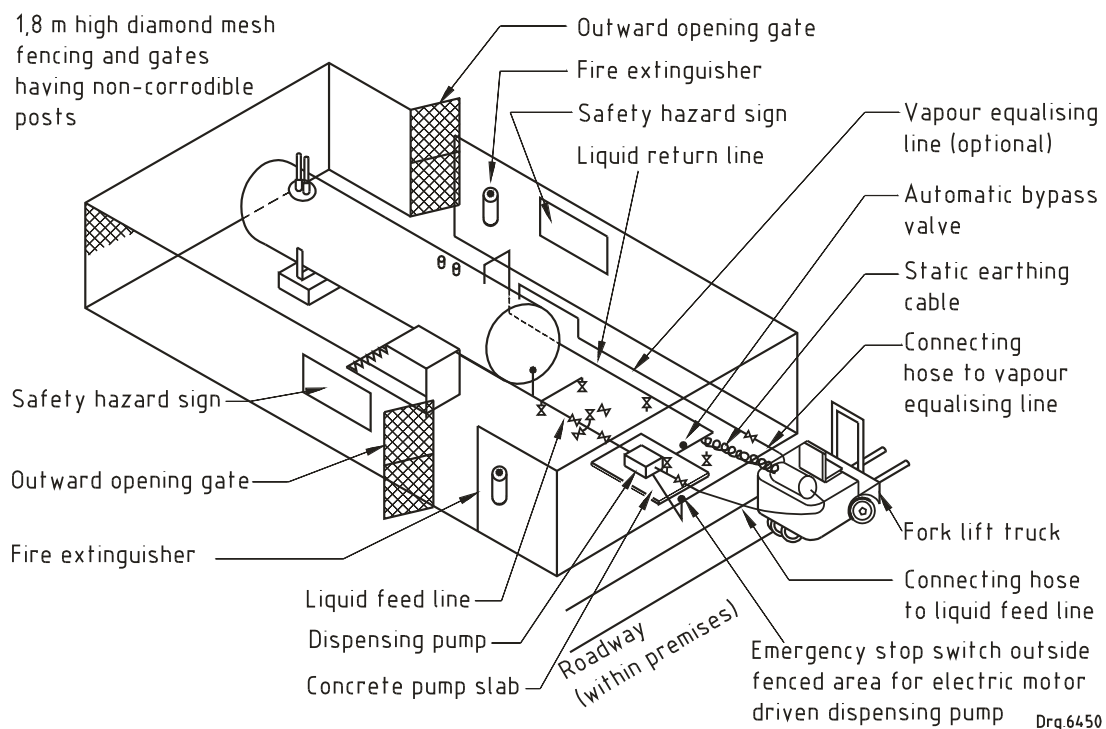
Typical layout for filling LPG fuelled fork lift trucks from bulk storage tanks
